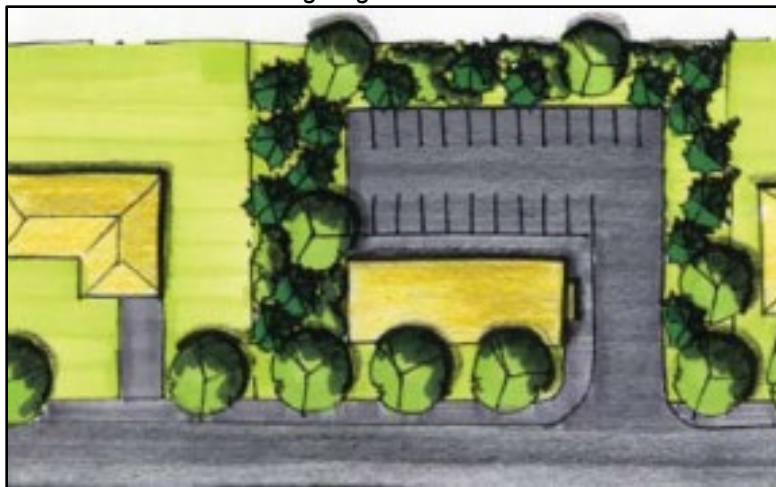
The tree line demonstrates a natural vegetation buffering this parking lot from the view of adjacent properties and the street.
